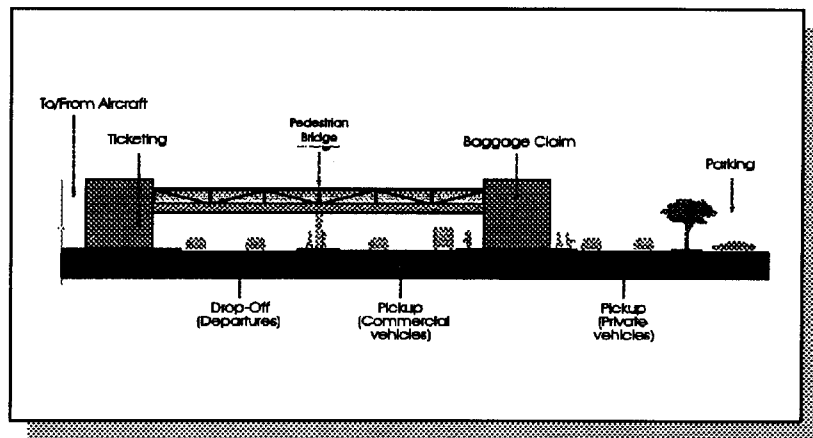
Laterally Separated Ticketing and Baggage Claim Facilities
